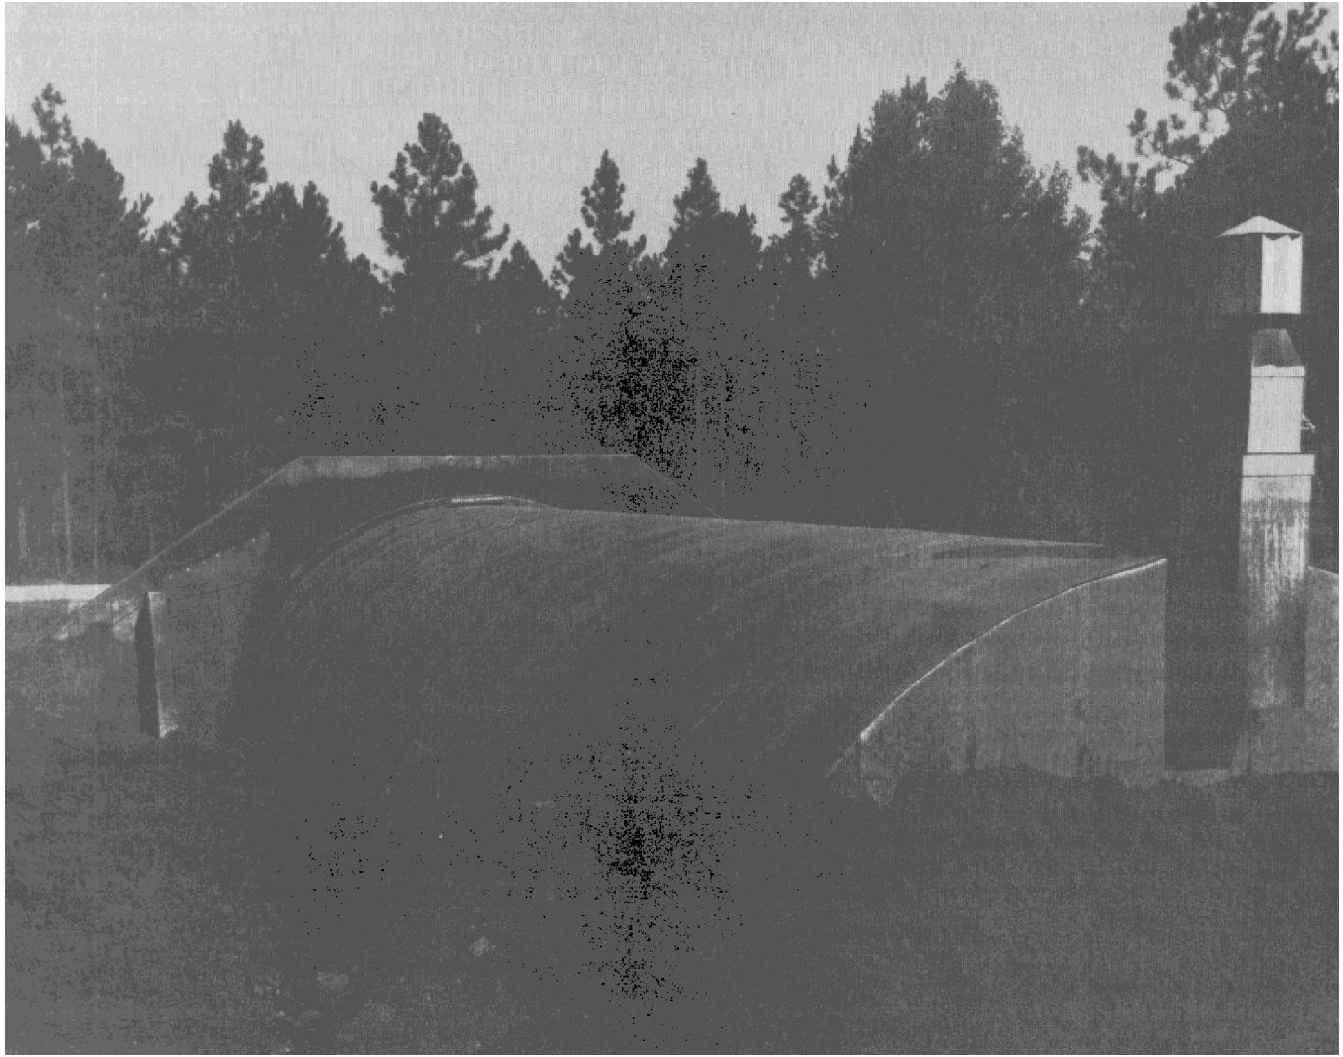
WATERPROOFING IGLOO—BACKFILL
